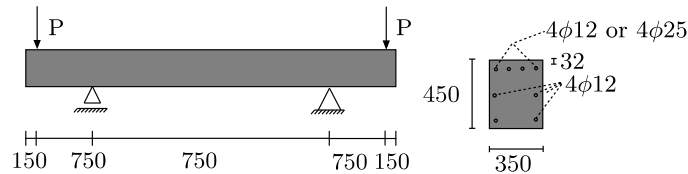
Loading scheme and cross-section (all dimensions in mm).
